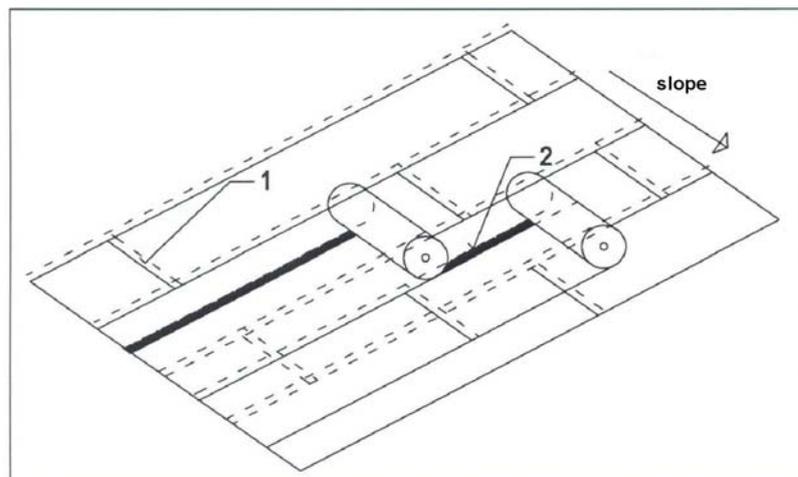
Types of overlaps (1 - frontal, transversal, 2 – side, longitudinal)
